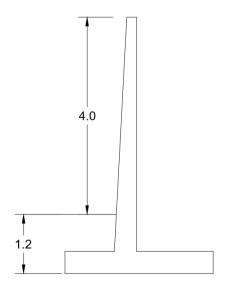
Cantilever retaining wall (Depth of foundation)
